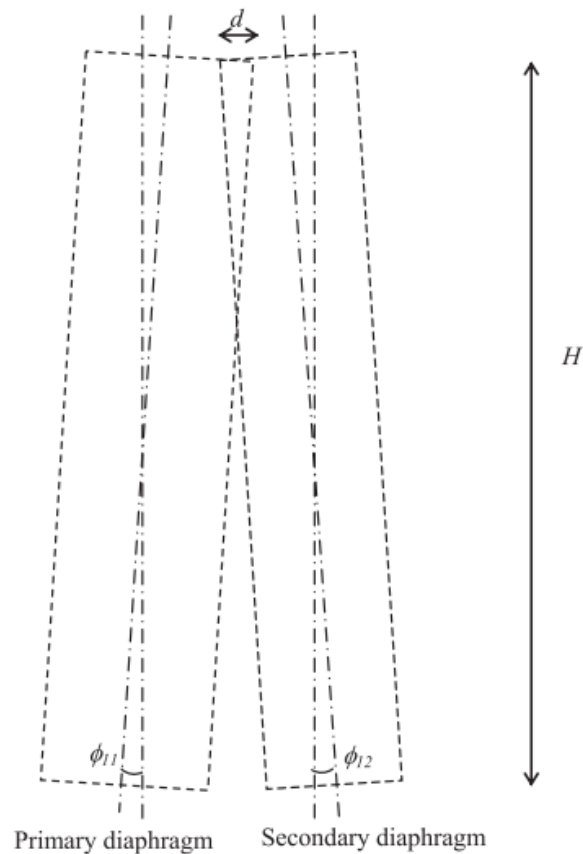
Two inclined adjoining diaphragm walls ([Castaldo et al., 2018](#))
